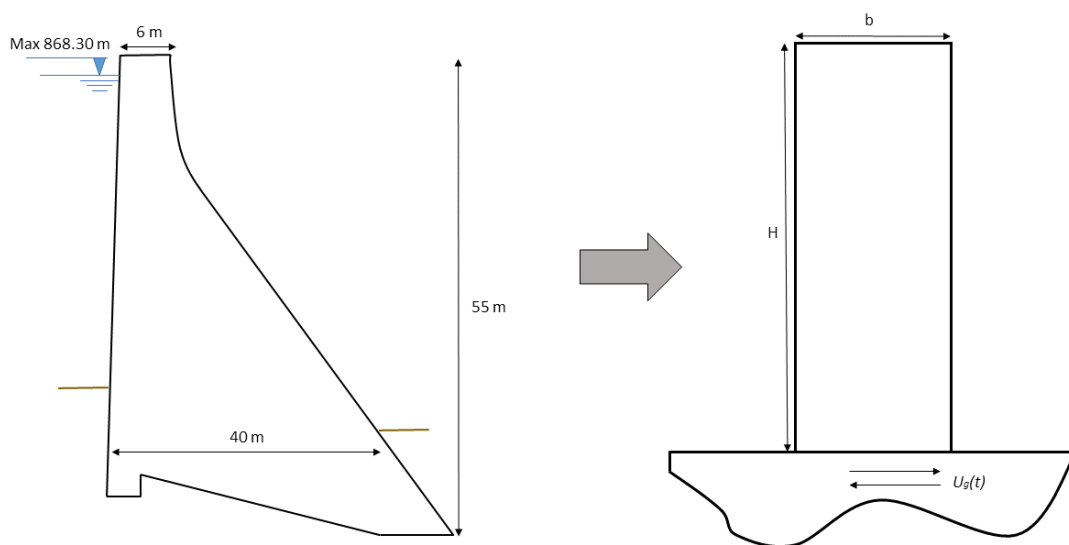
Central transversal section of the case study dam (left); clamped shear beam model (right)
